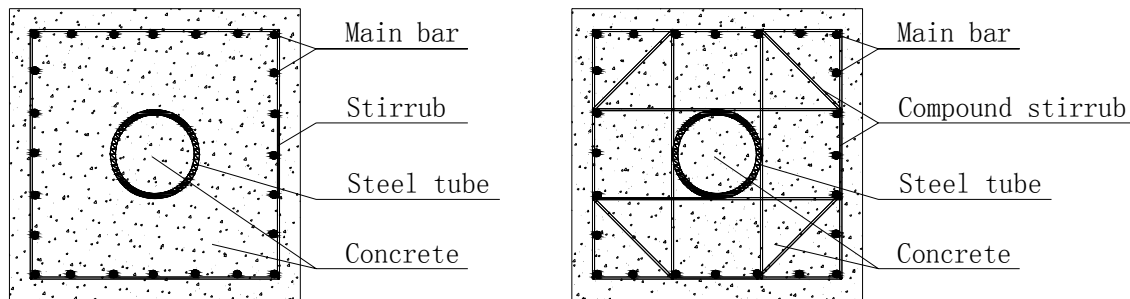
Common section forming of the concrete-filled core steel tube reinforced concrete column
